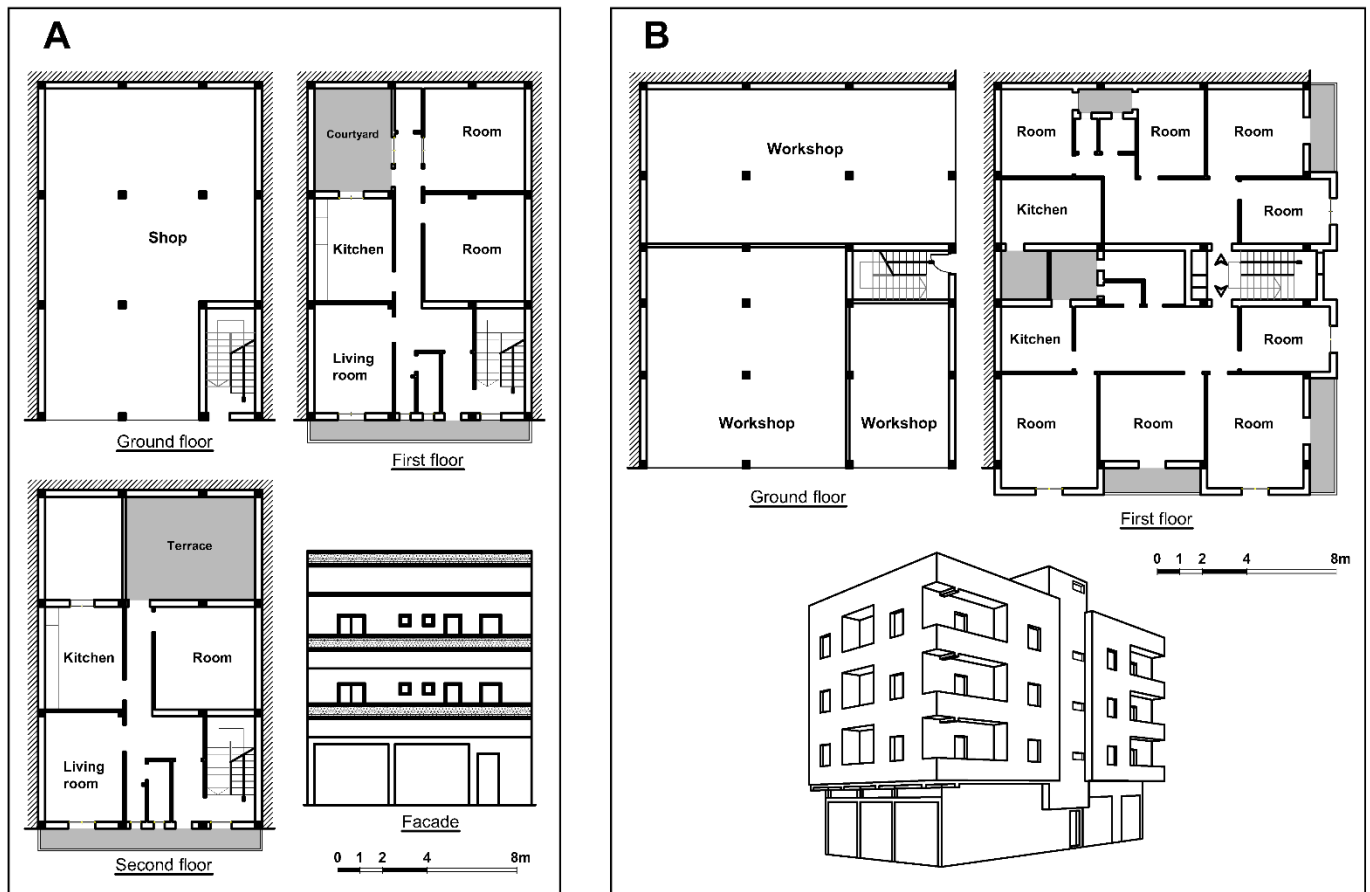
Examples of apartment buildings. A: Small building with one apartment per floor; B: Corner building with two apartments per floor. (Source: Authors, 2024)
